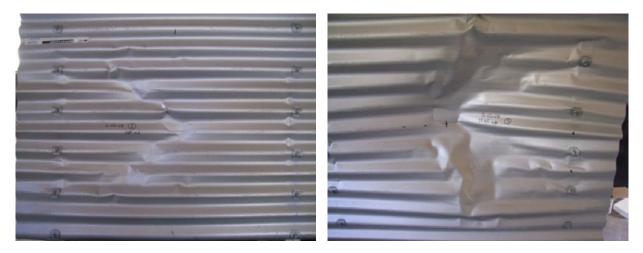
Cladding damage after Trials C3 (left) and C4 (right)
